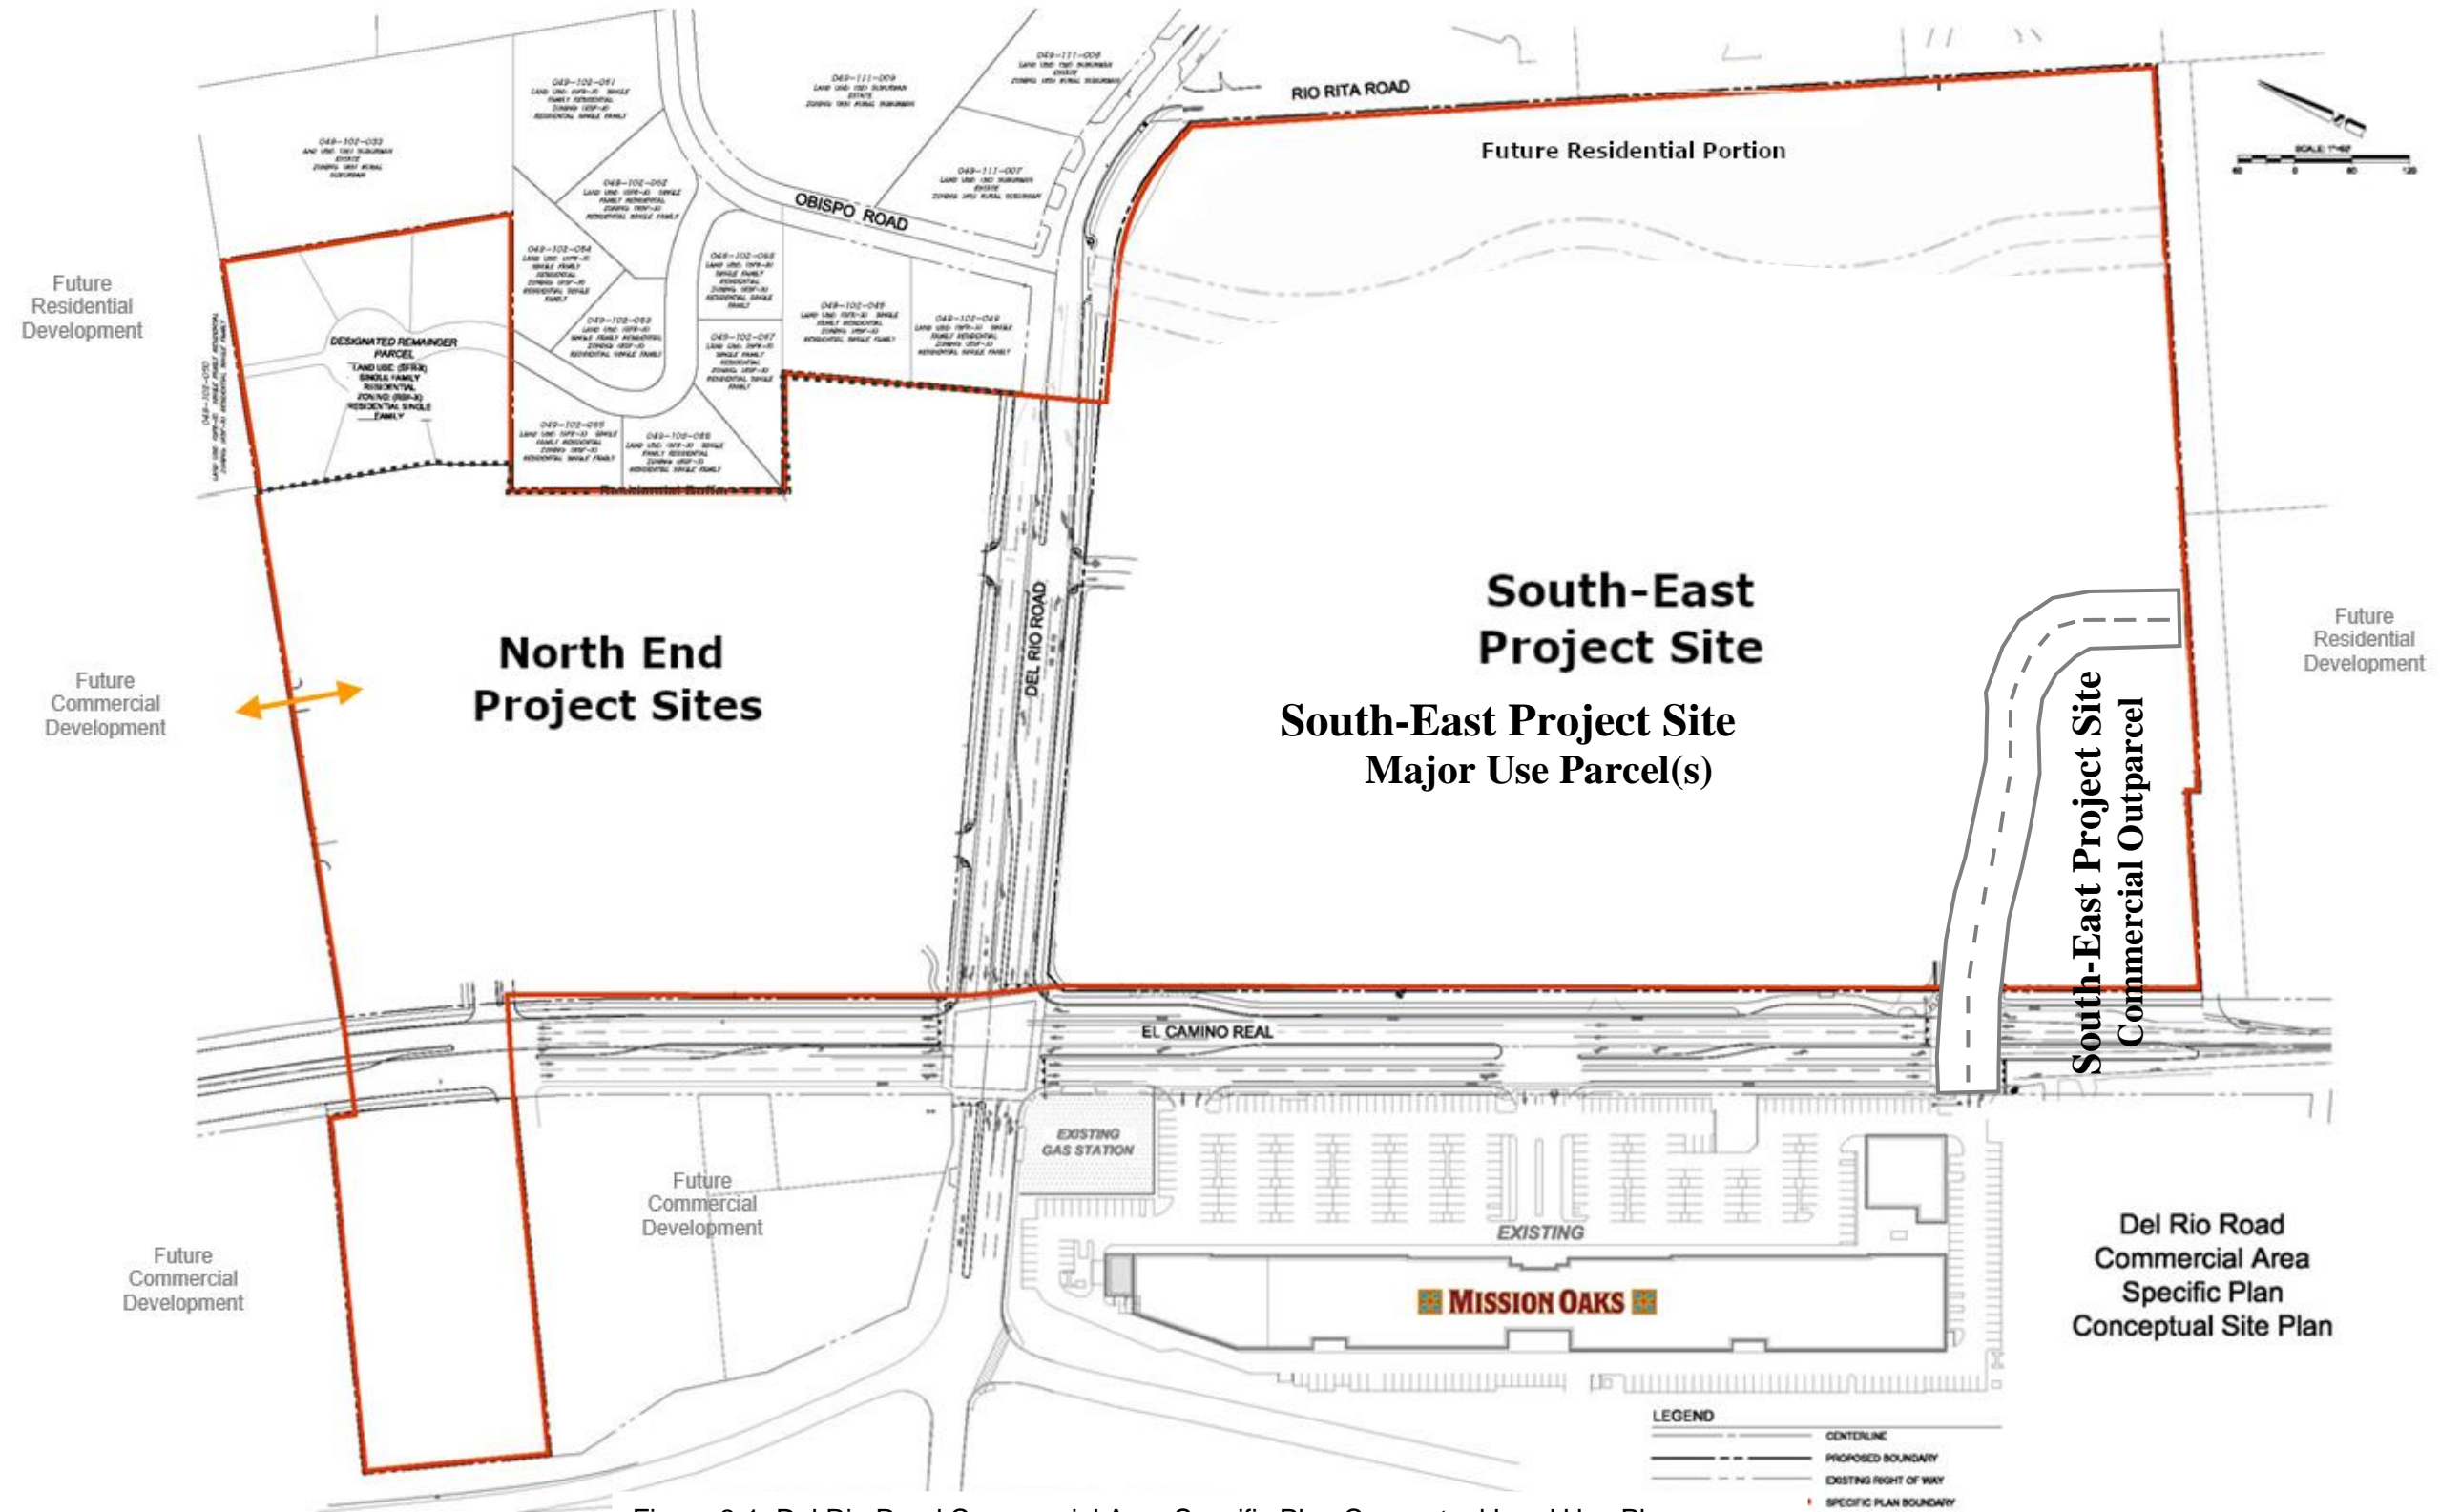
Del Rio Road Commercial Area Specific Plan Conceptual Land Use Plan
